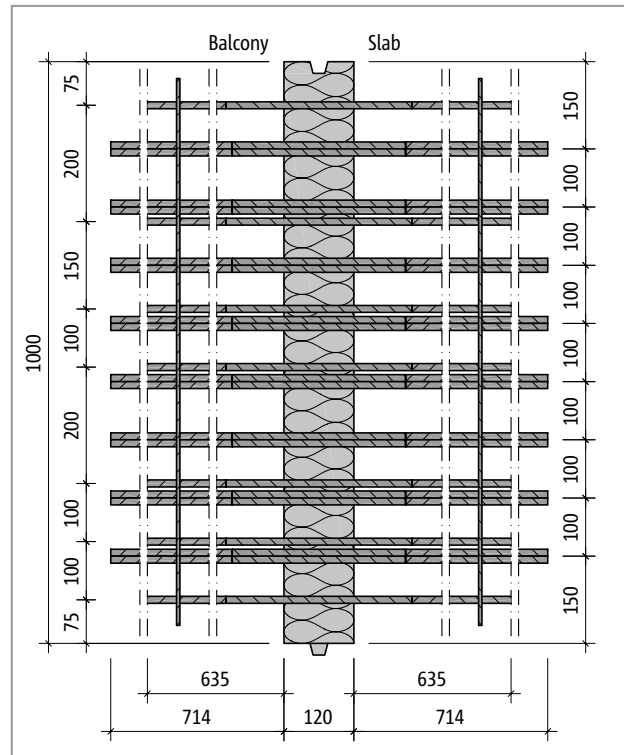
Schöck Isokorb® XT type D-MM3-VV5: Layout
